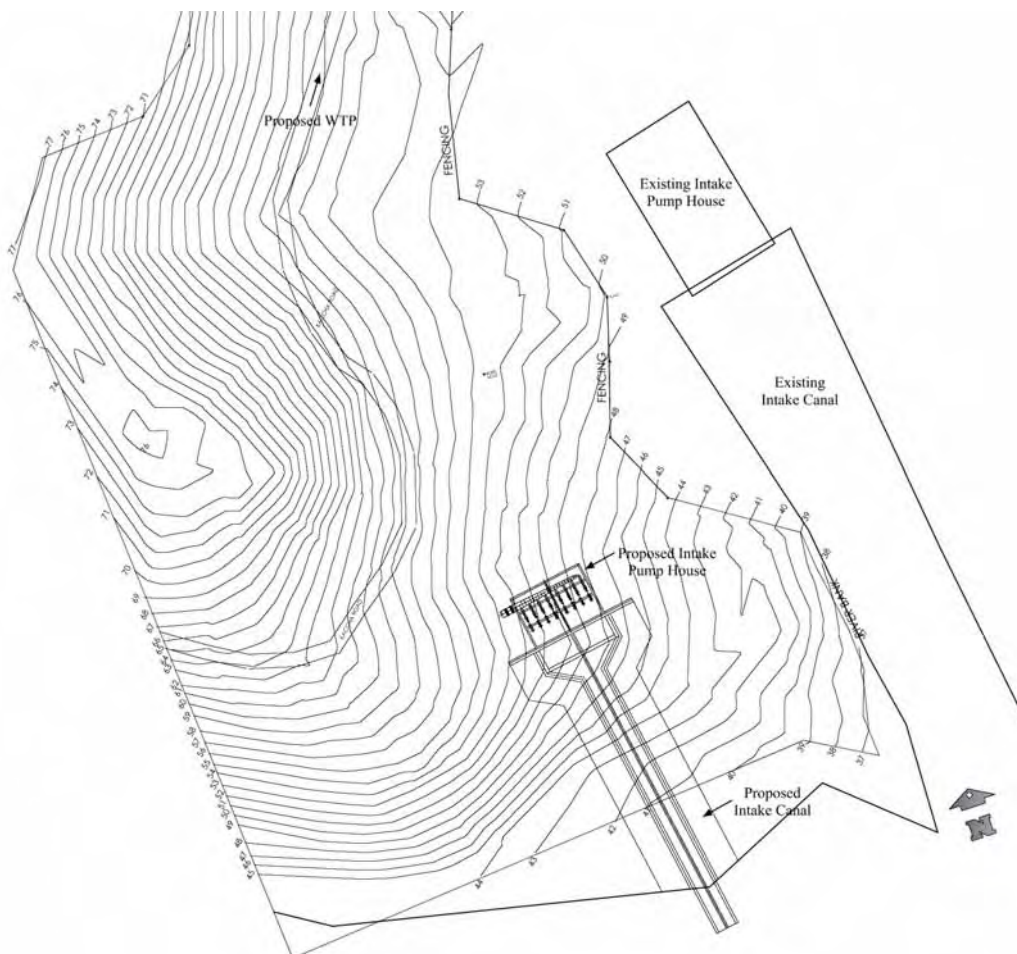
General Layout Plan of Intake Facility for the Proposed WTP
